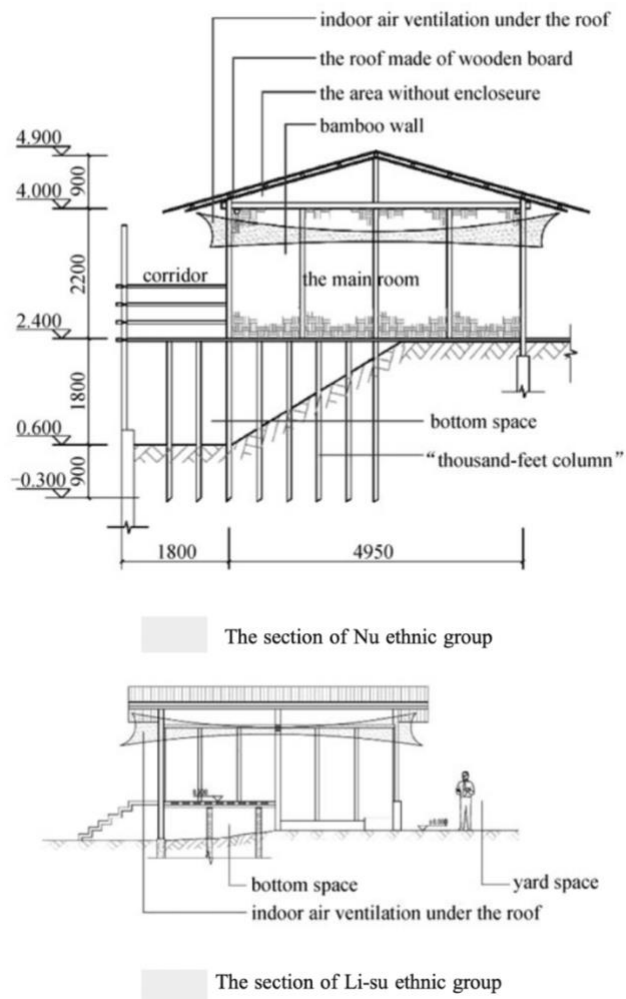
Section of Nu and Li-su dwellings showing the stilted bamboo structure that elevates the house and other structural details such as walls and air enclosures. The unit of measure is unclear for values marked on the image.<sup>28</sup>
